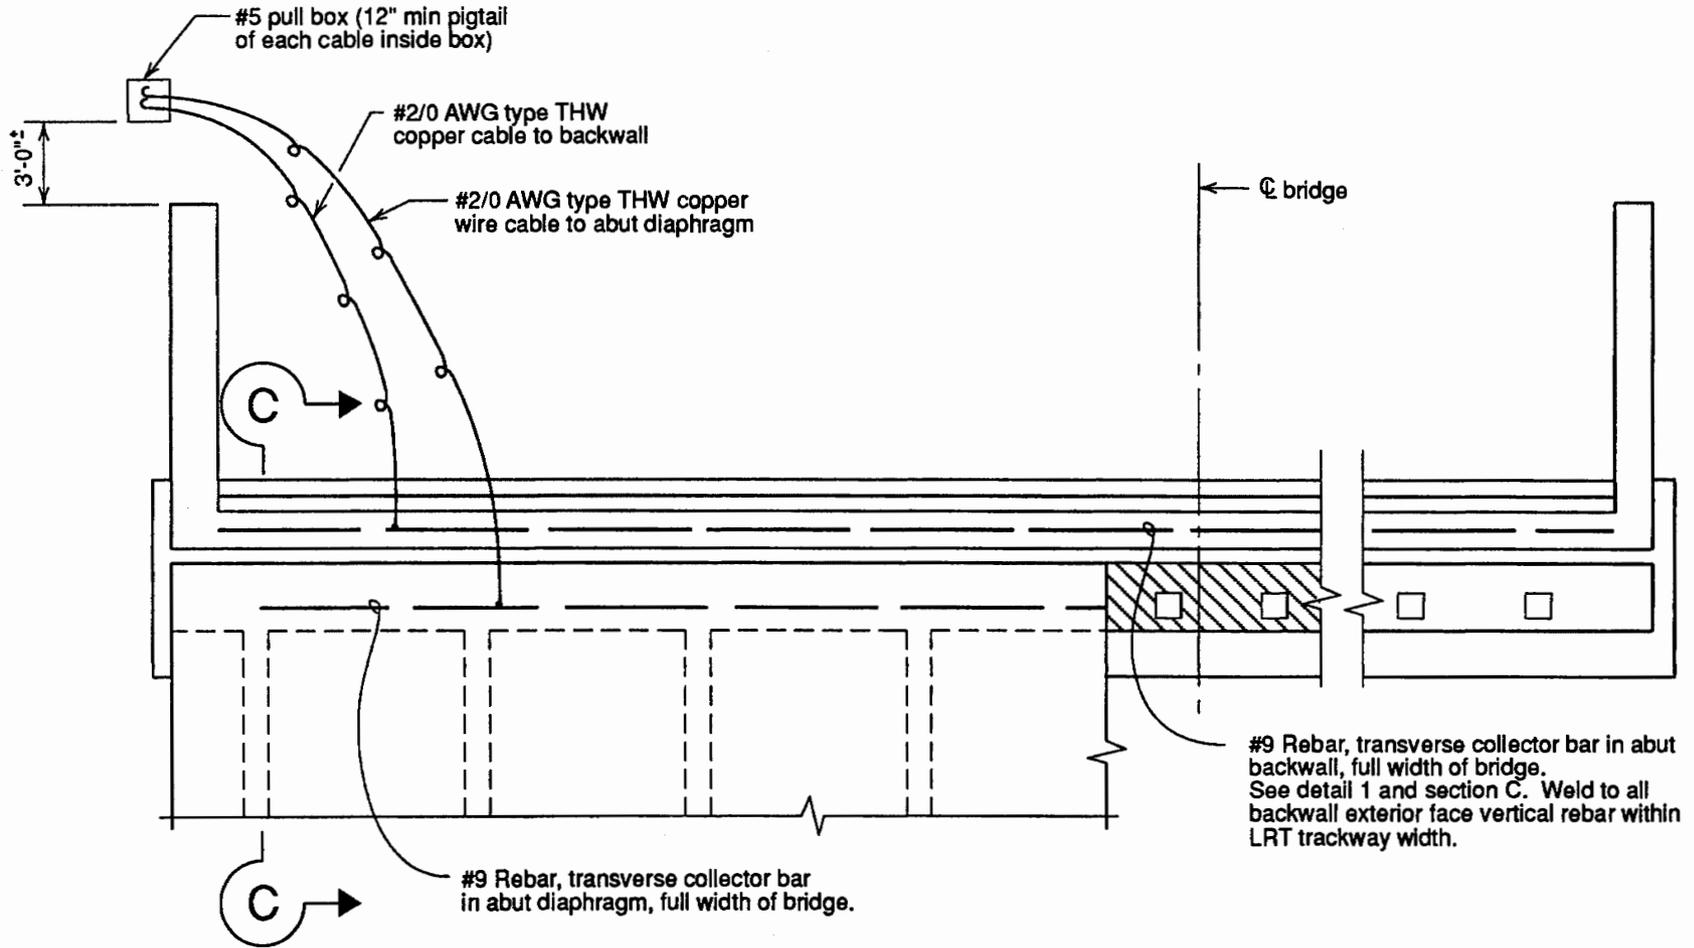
COPPER CABLE TO REBAR CONNECTION
